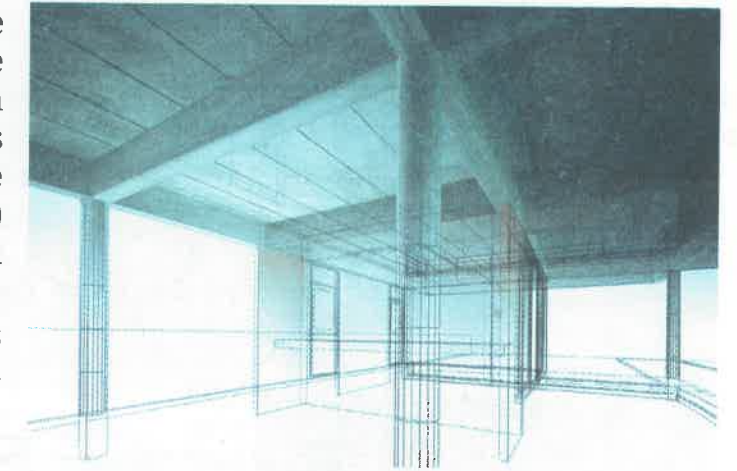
Beams support the roof; more weight can be placed over beams compared to the rest of the roof.
